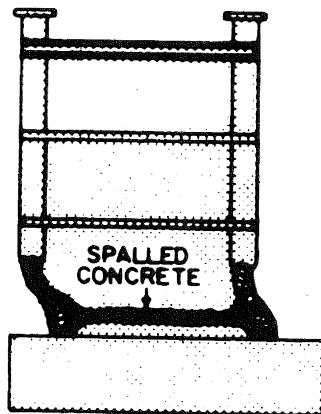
Sliding Shear Failure Initiated by Web Crushing.
